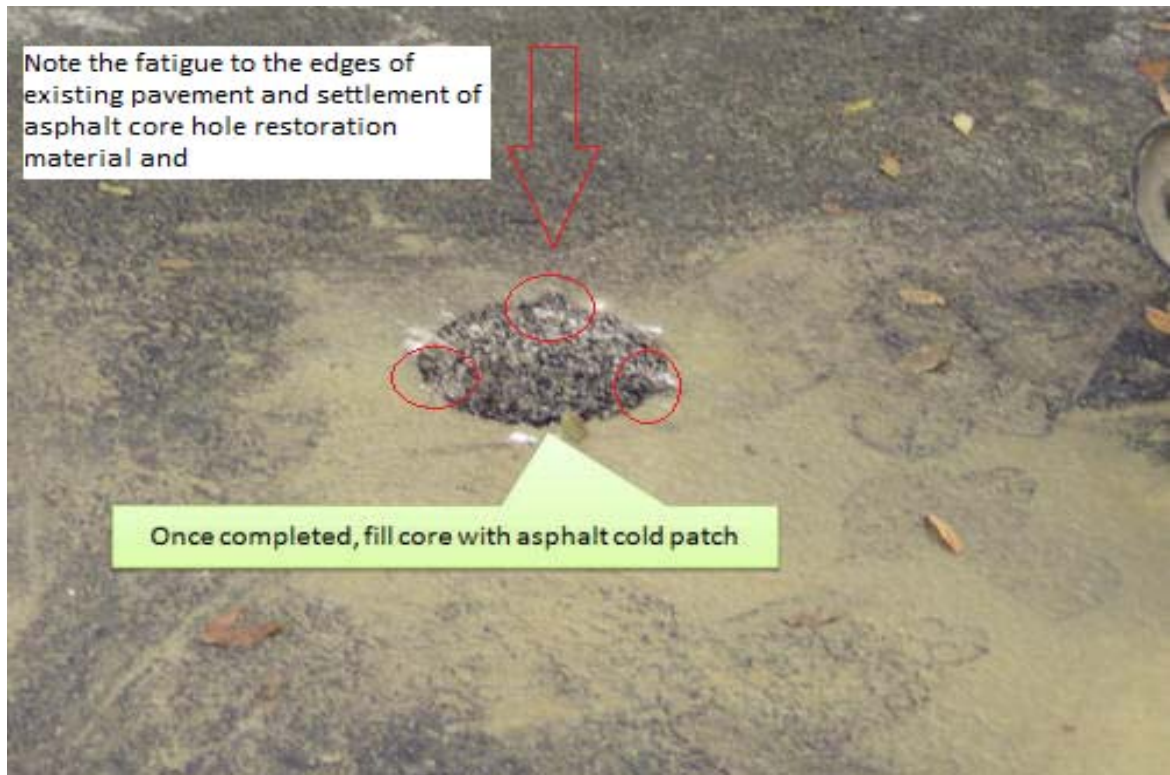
Fatigues to Existing Pavement Structure
